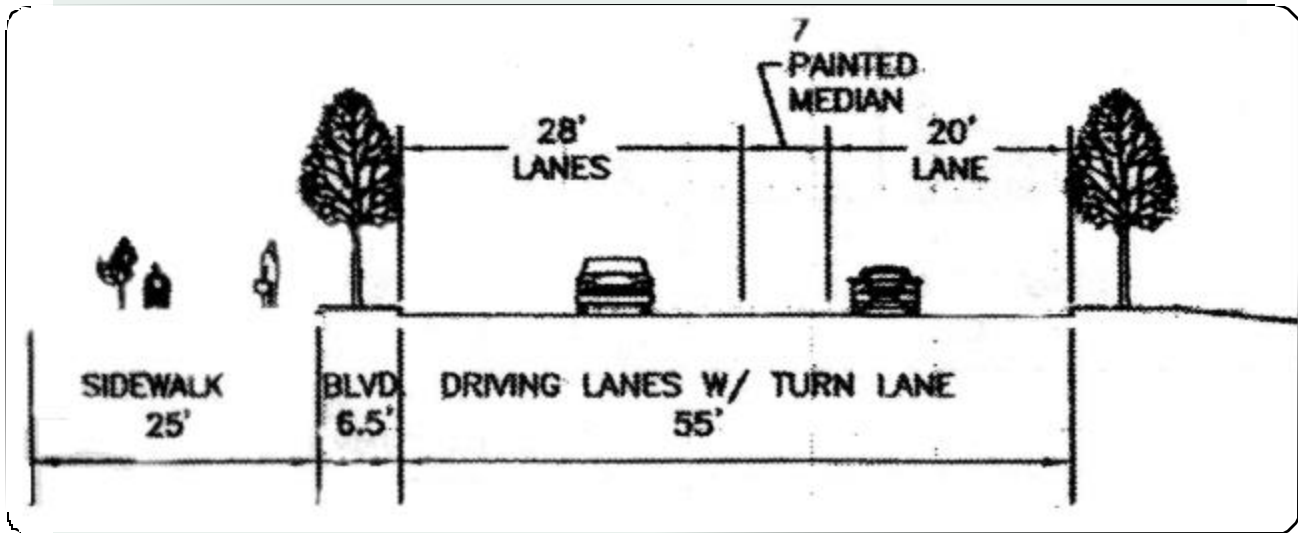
Existing street section of 46th Street between CP rail line and Hiawatha, facing east.
